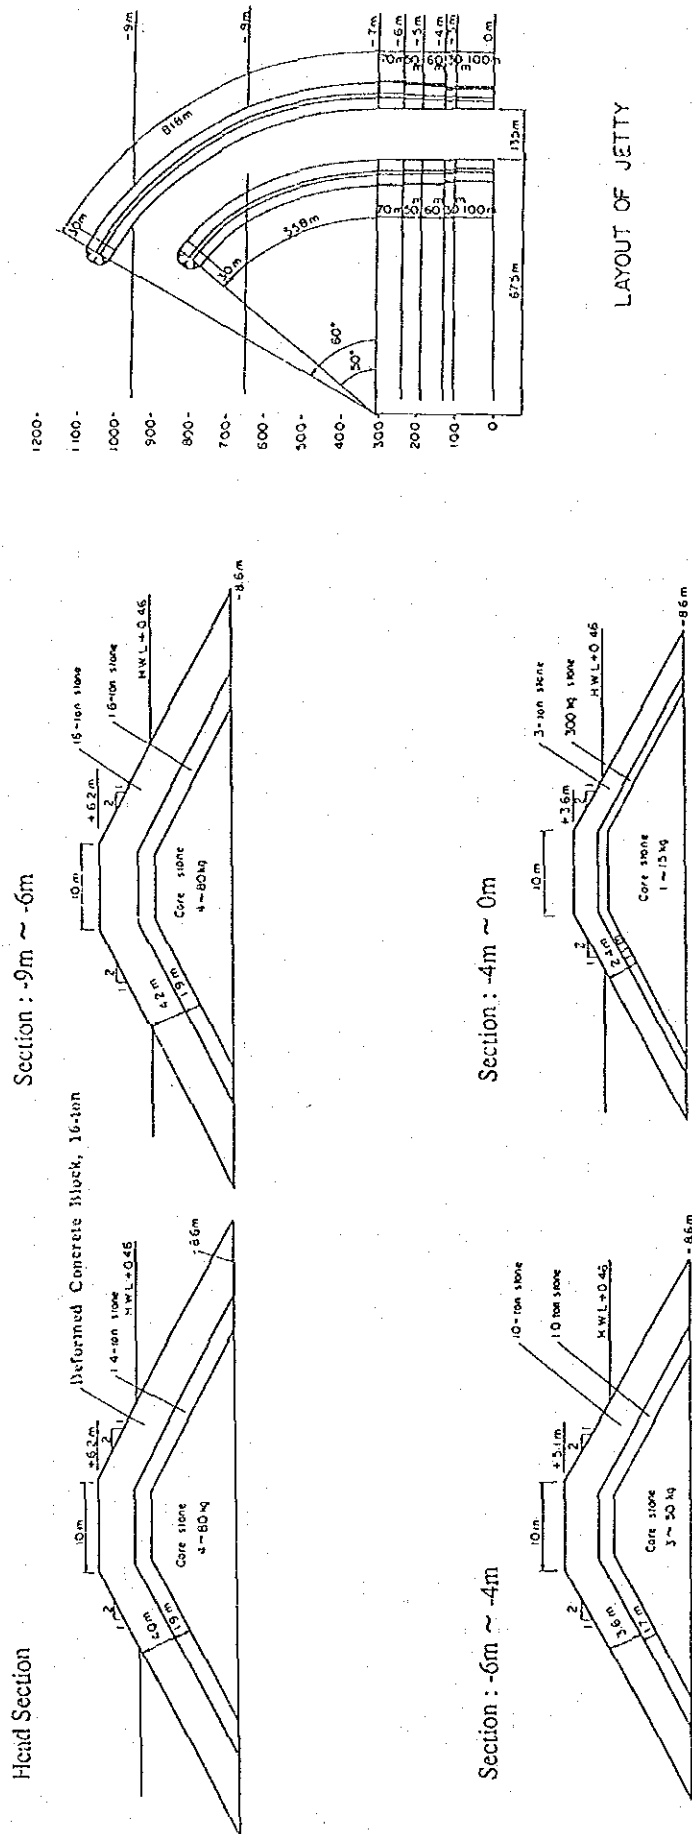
CROSS SECTION AND LAYOUT OF JETTY AT NAVEGANTES COAST
